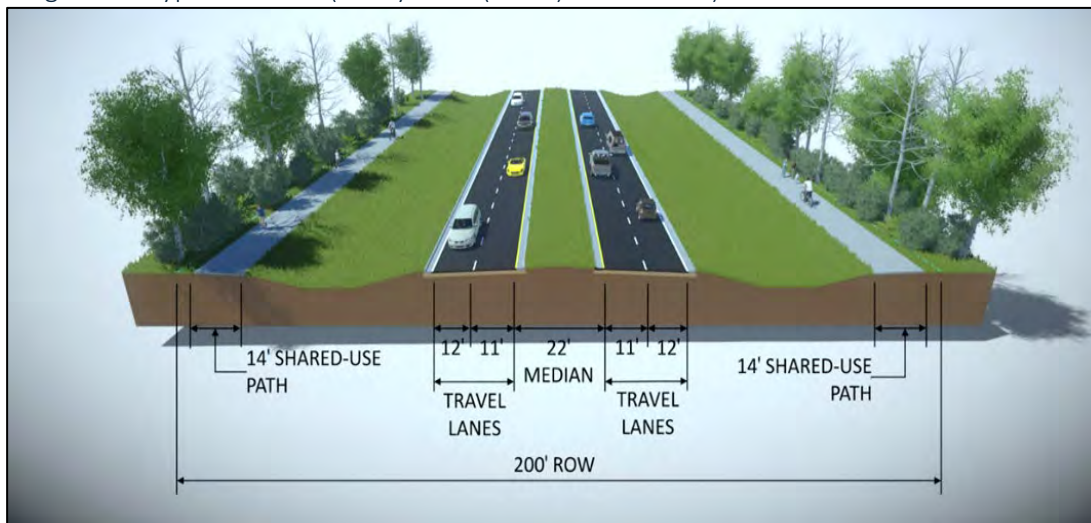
Segment 1 Typical Section (Friday Road (South) to Friday Road (north))
